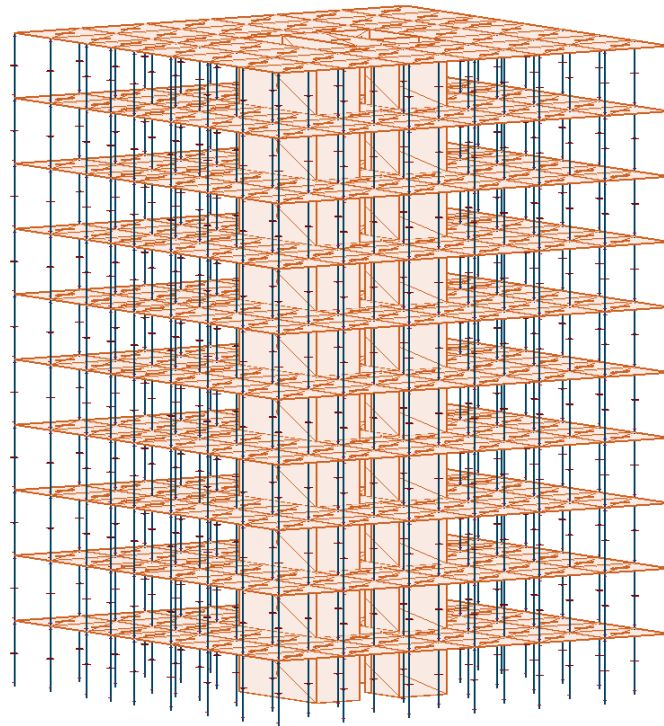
FE model of the column building seen from the side, without showing cover elements. 10 storeys tall.
